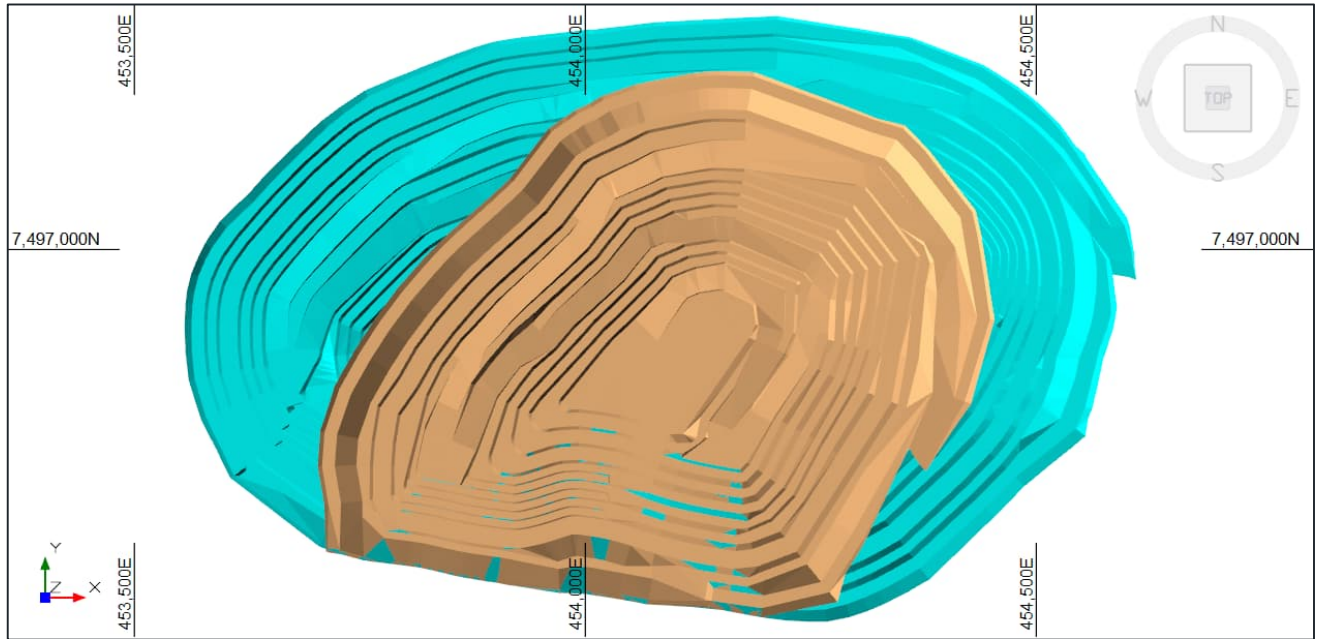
Stage 1 (Gold) and Stage 2 (Blue) Pit Designs in Plan View
